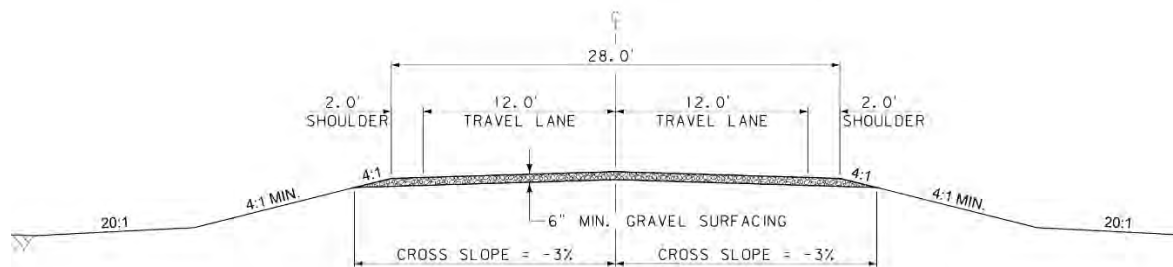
Standard Low Speed Gravel Road Typical Section
